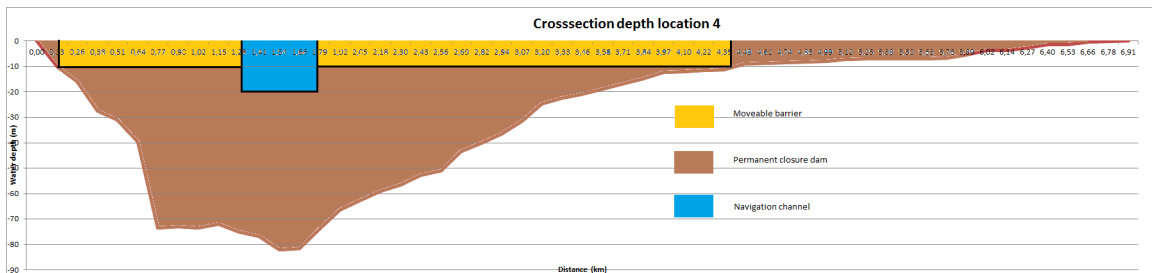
ALTERNATIVE 2 DETAILED DISTRIBUTION RETAINING STRUCTURES
